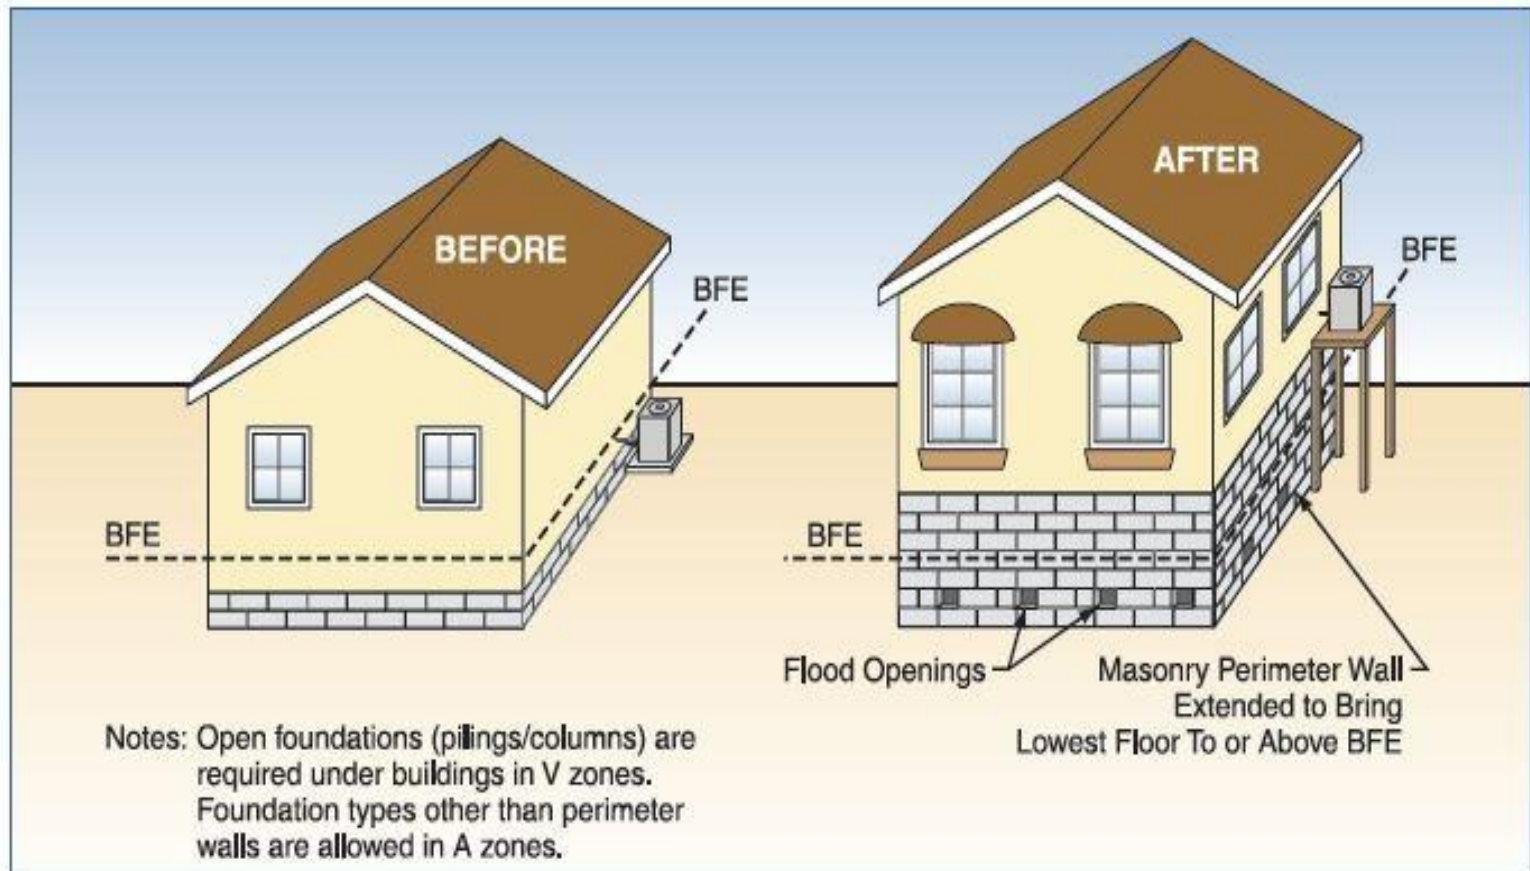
Rehabilitation or remodel (no increase in footprint) of residential building in an A zone – the proposed work was determined to be a substantial improvement. The building is brought into compliance by elevating it on an extended perimeter foundation wall, installing flood openings, and raising the HVAC equipment onto a platform.
